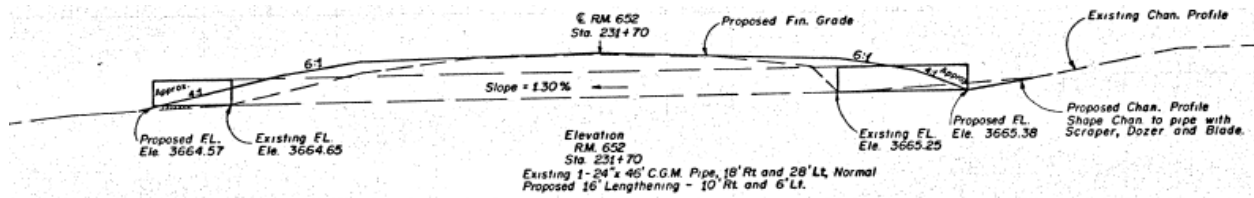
1970 Plan Detail for Culvert at STA 231+70.
